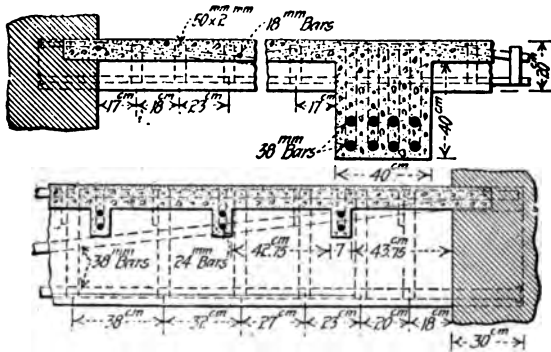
Floor for Palais de Justice, Viviers, France.
